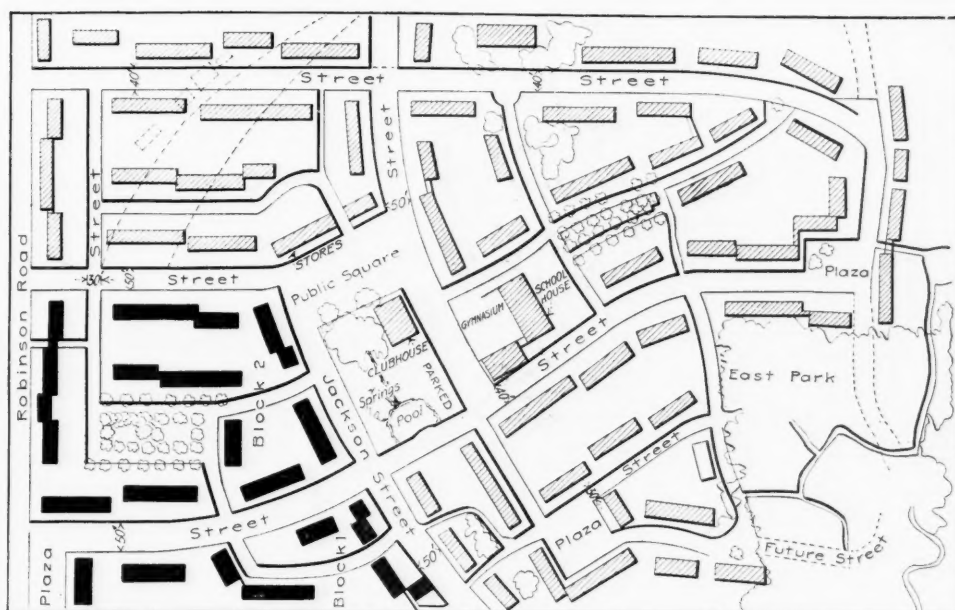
PLAN SHOWING LAYOUT OF STREETS AND LOCATION OF HOUSES
